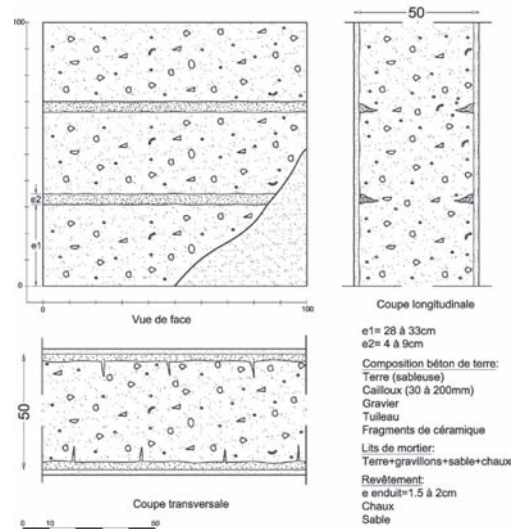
View of a wall with mortar joints—plan and sections. (Aliche, S., 2011).
